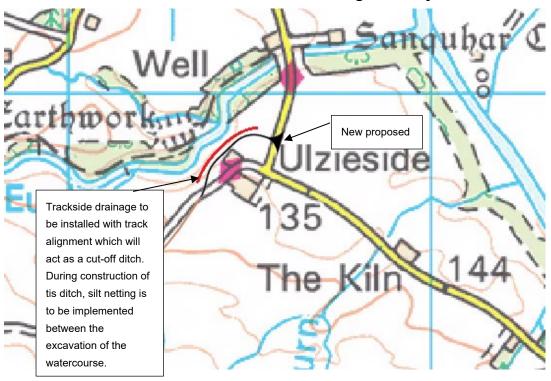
Site Entrance Access Track Indicative Mitigation Layout
